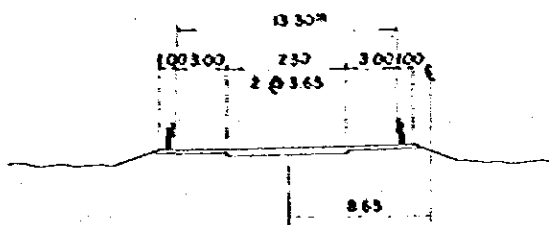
TYPICAL CROSS SECTION C-6
